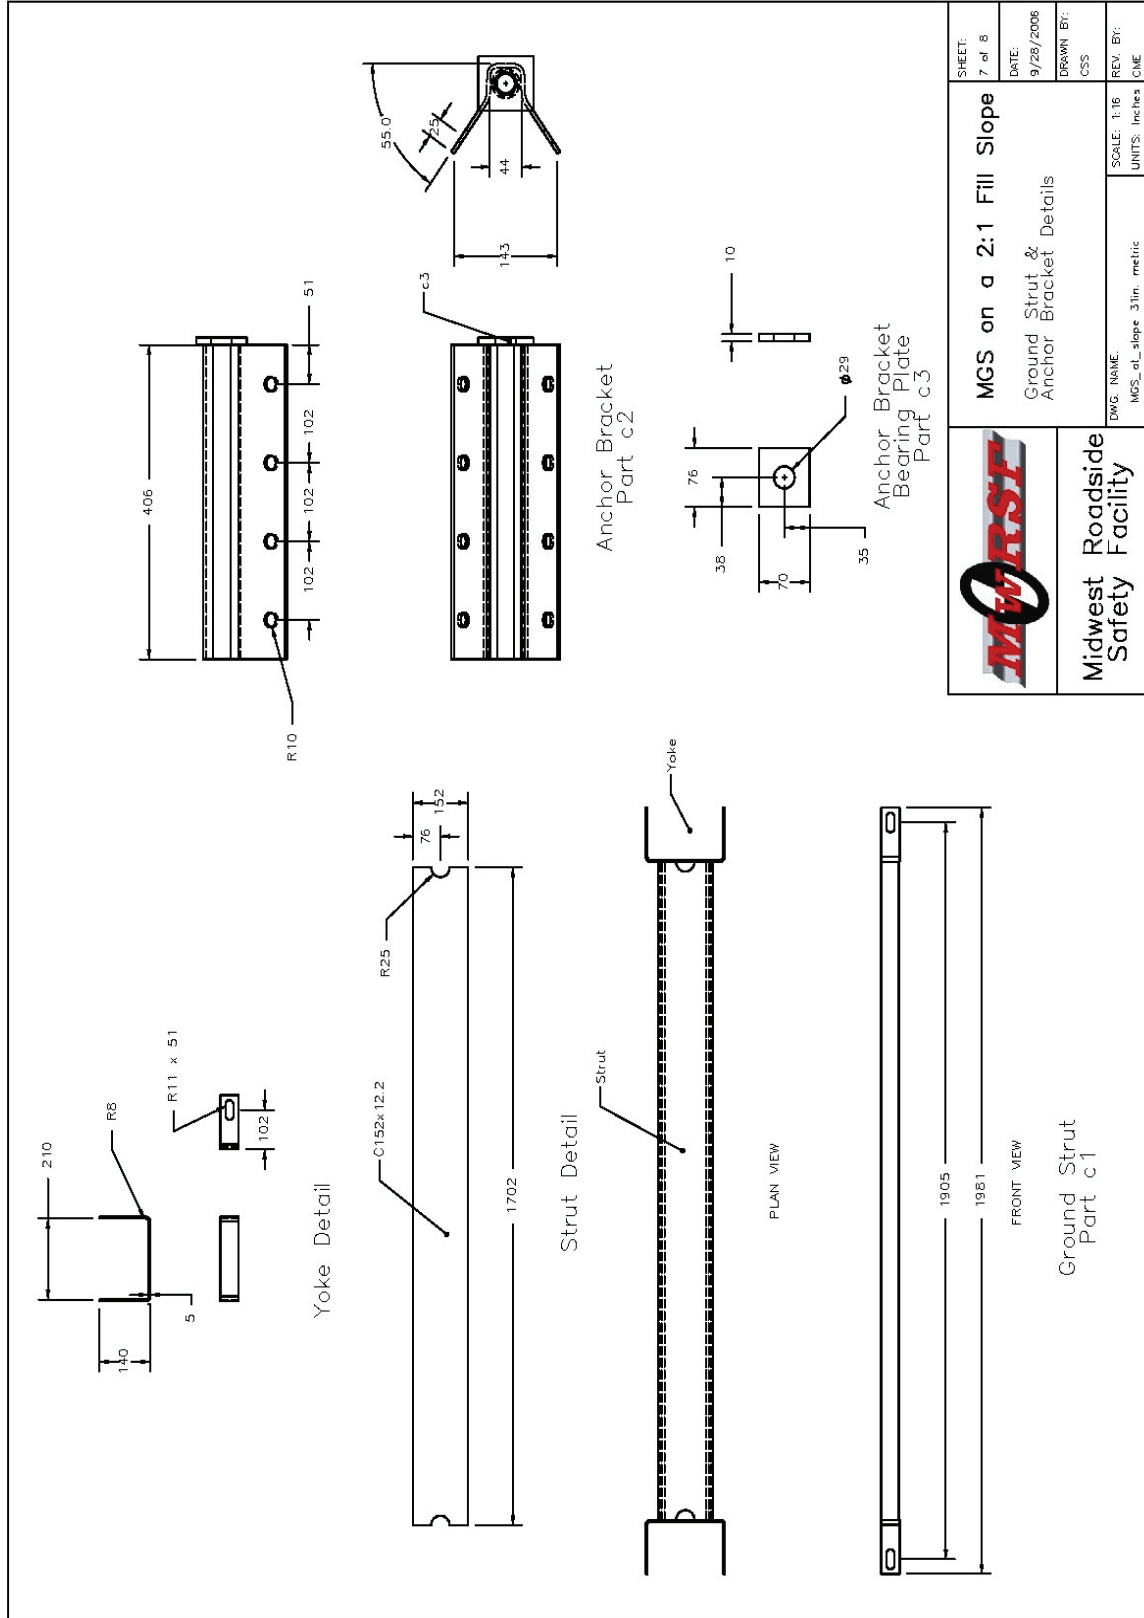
Ground Strut and Anchor Bracket Details, Test No. MGS221-2 (Metric)
